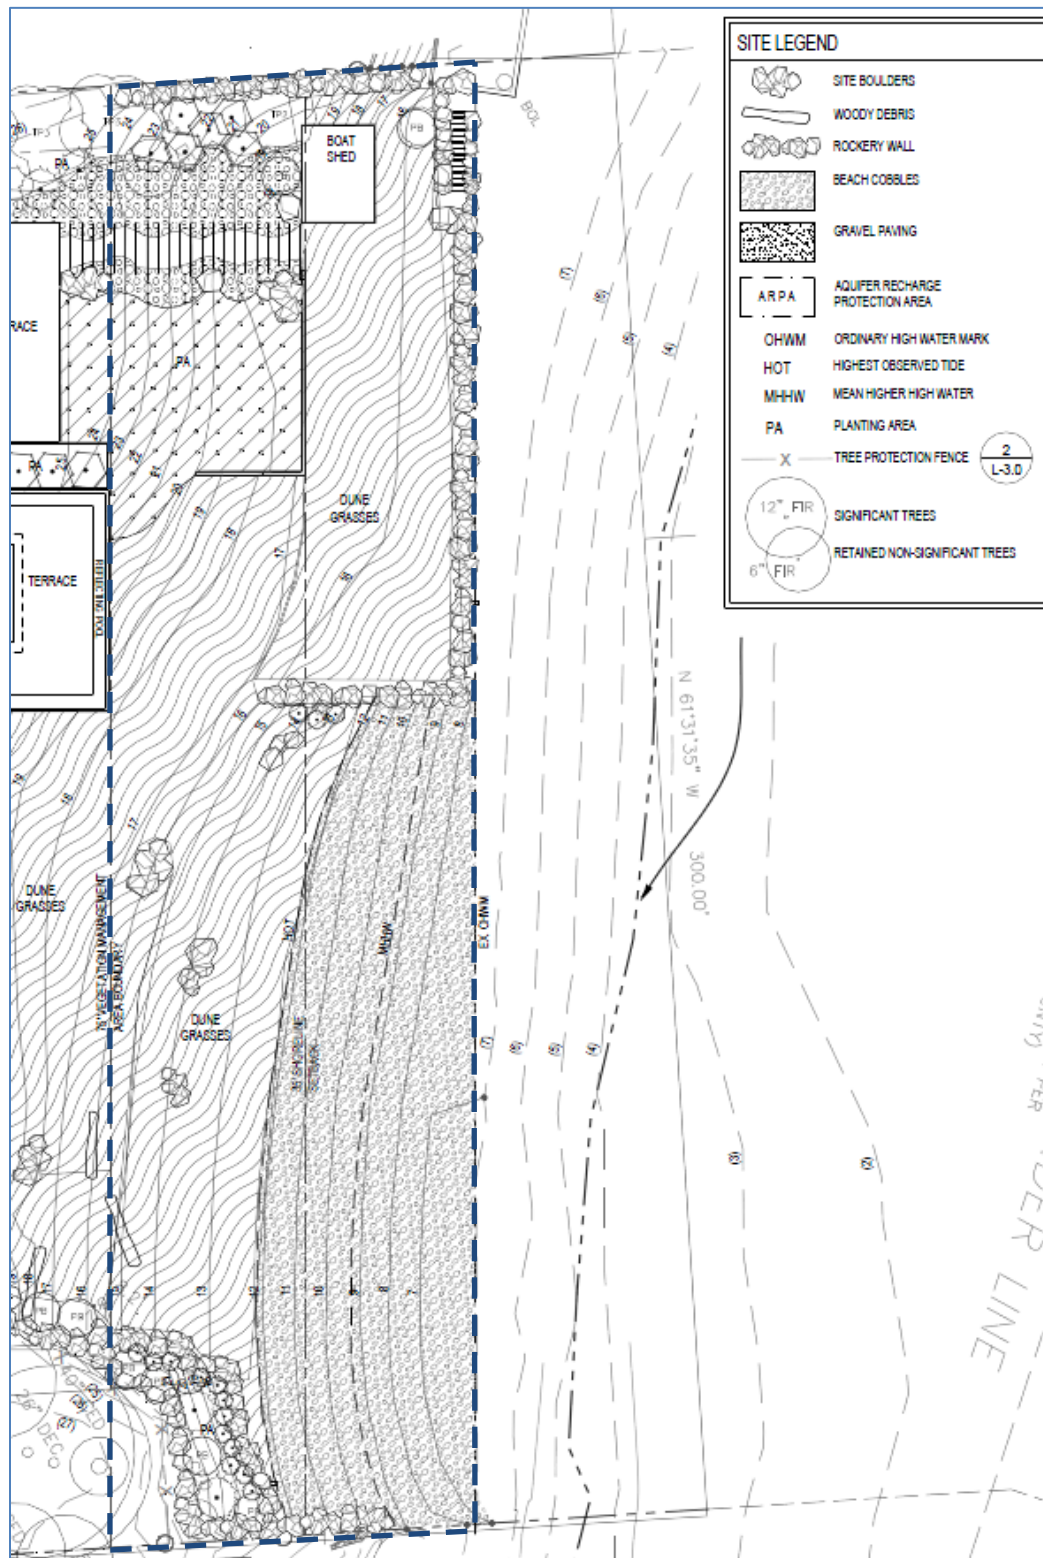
Vegetation Management Area (Detail from Sheet L-3.1 Planting Plan)
